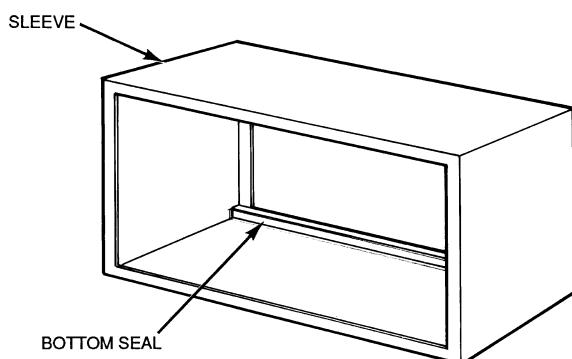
Remove Bottom Seal From GE Plastic Sleeve
